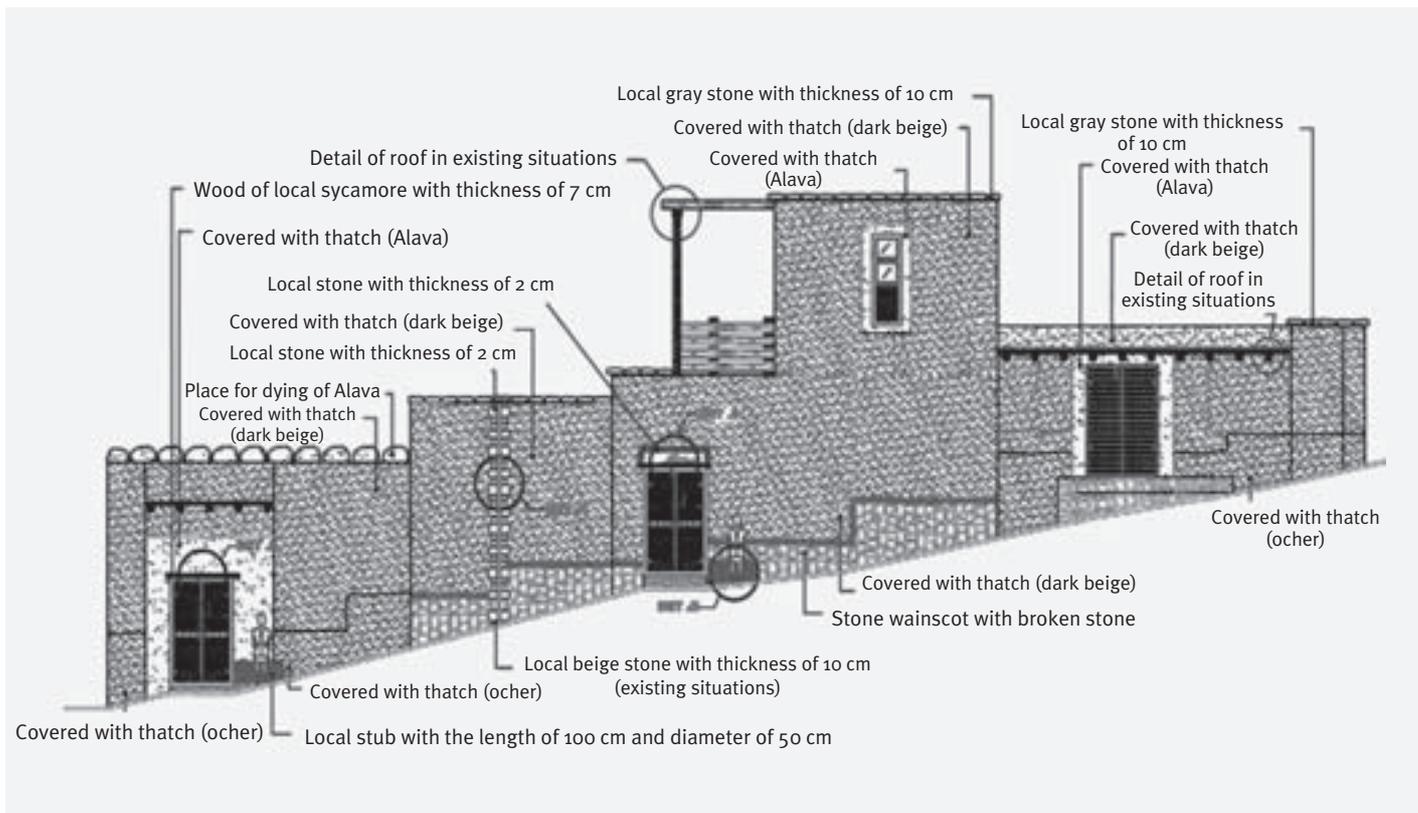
SUGGESTED FAÇADE FOR A WALL, KAZAJ
